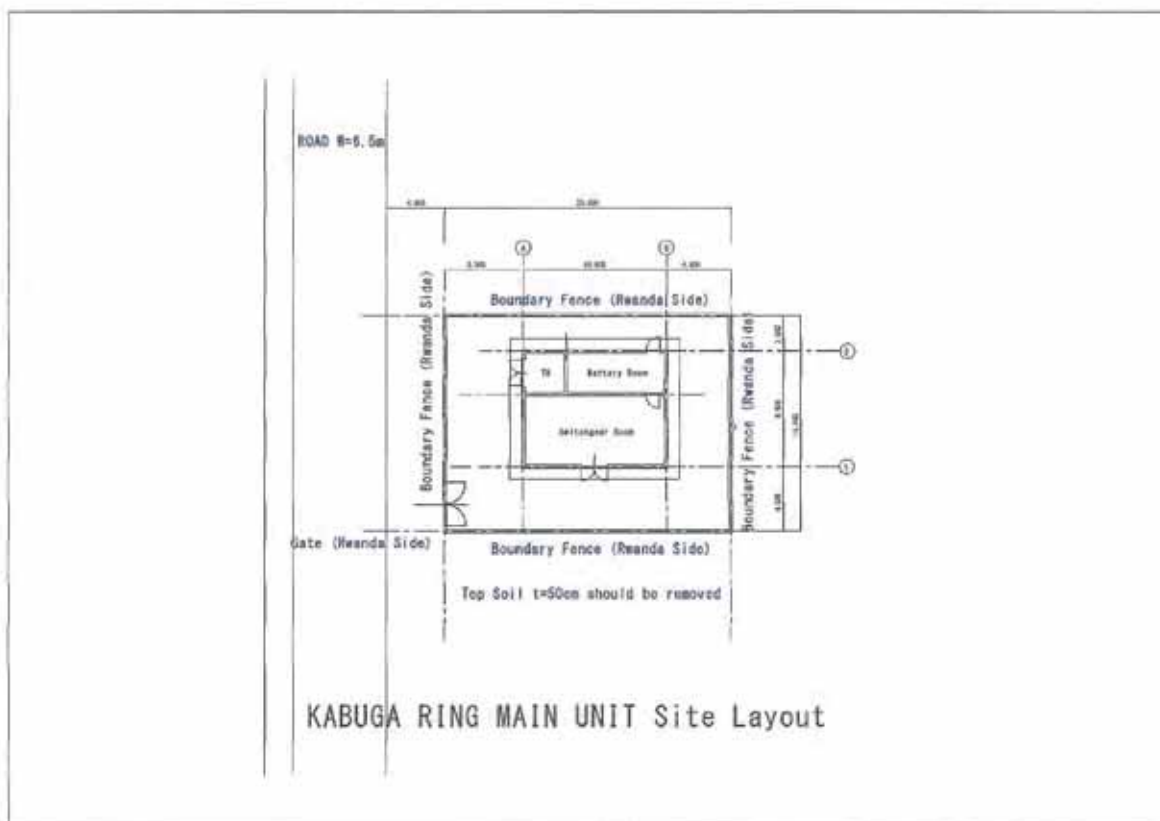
Land Preparation Work Site Layout at Kabuga RMU Switching Station
